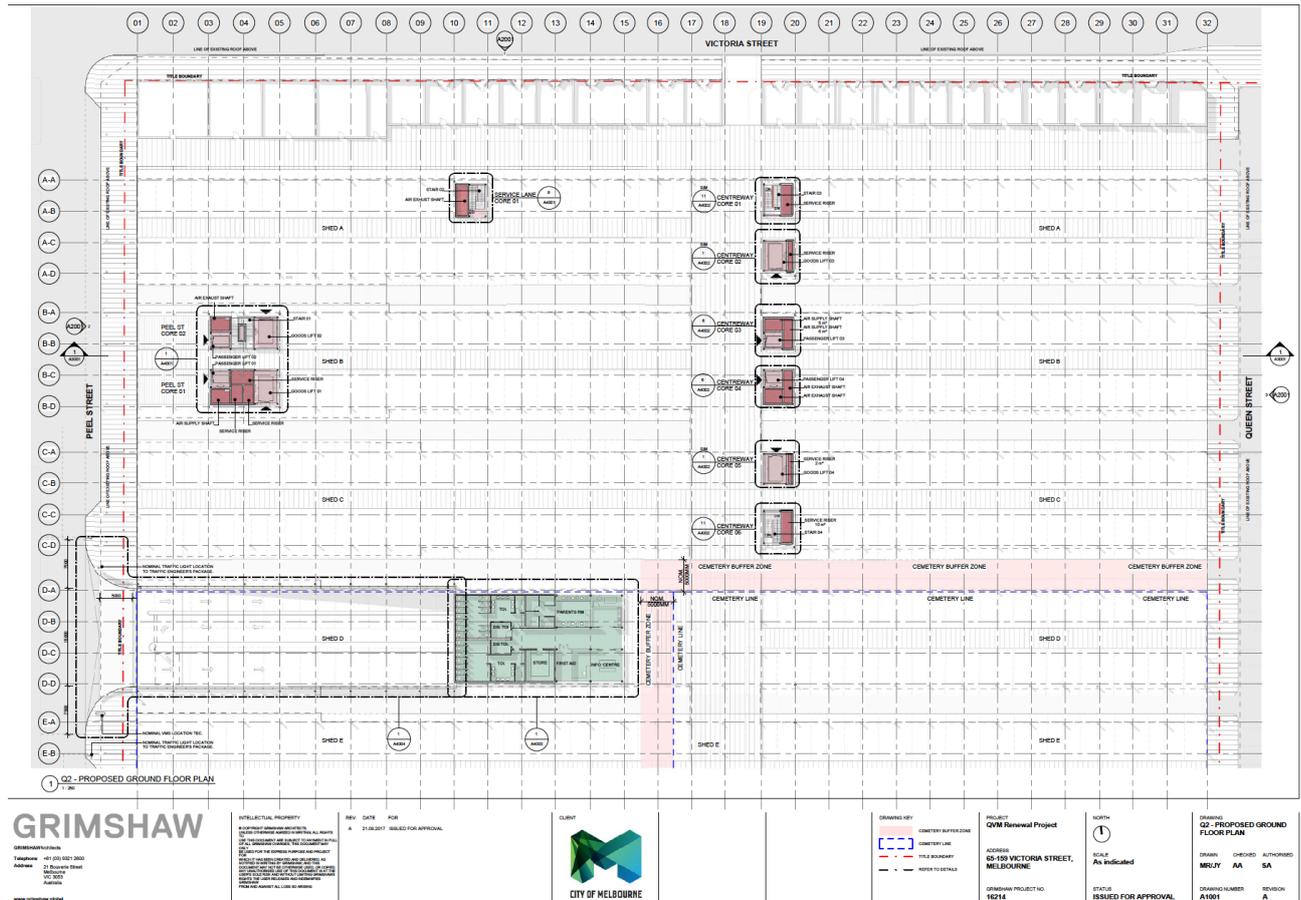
Grimshaw, Drawing Q2 – Proposed Ground Floor Plan, Drawing Number A1001,
